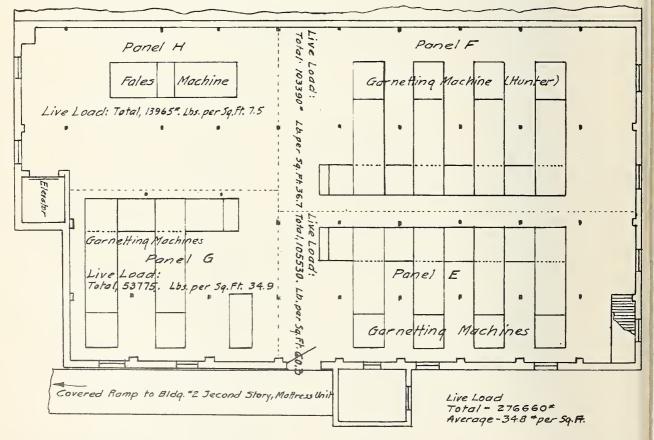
Second-floor plan, building 3, mattress factory, Chicago, Ill.
